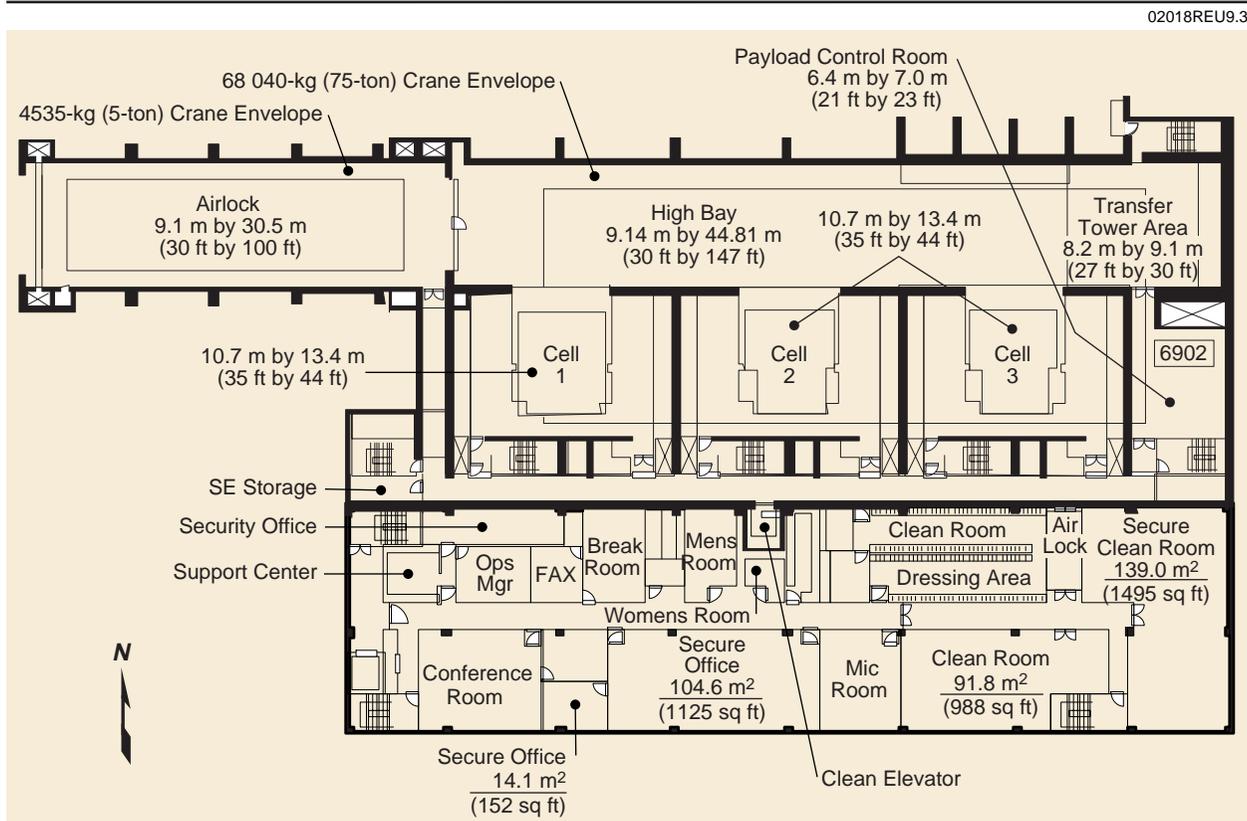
California Spaceport—Plan View of the Integrated Processing Facility
